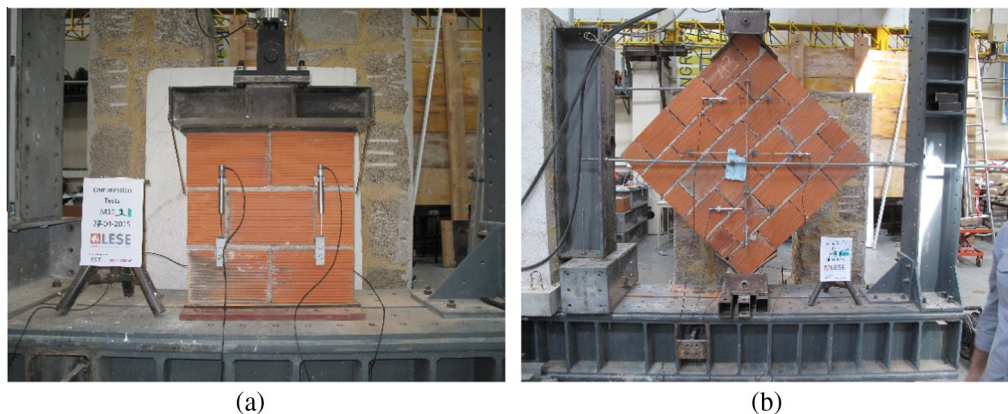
Layout of the masonry wallet tests: (a) vertical compressive strength test and (b) diagonal tensile strength test.
